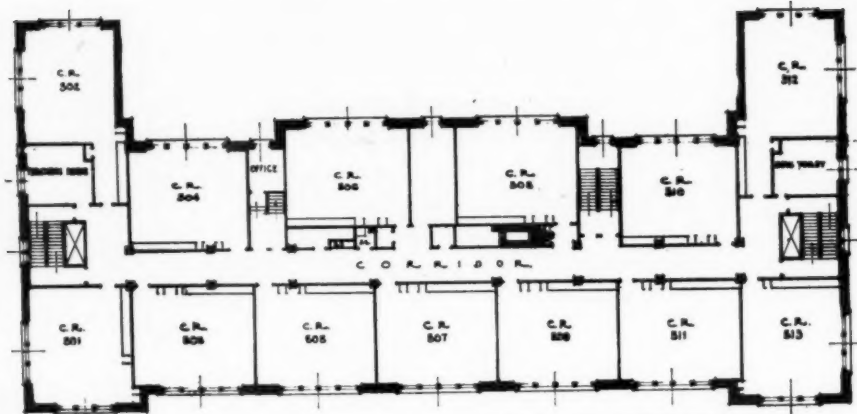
FIFTH FLOOR PLAN. TYPE "A" ELEMENTARY OR INTERMEDIATE SCHOOL
